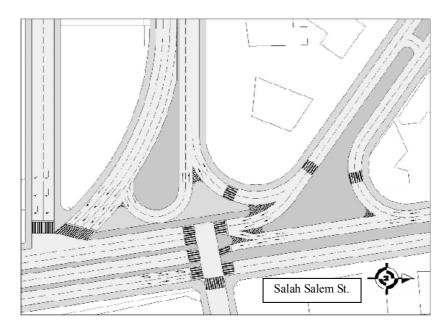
Improvement Plan for Salah Salem St.-Malek El Saleh Br. Intersection
